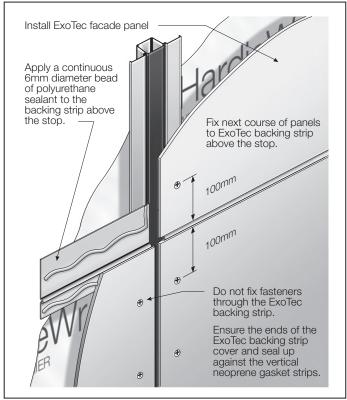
INSTALLING NEXT COURSE OF PANELS DETAILS
